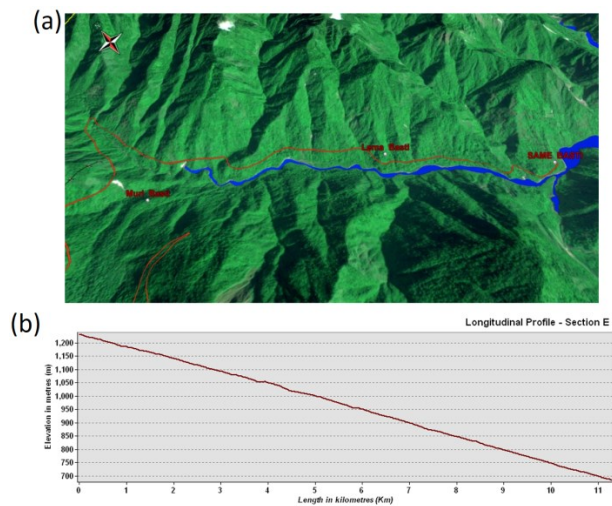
(a) 3D-view and (b) longitudinal profile of E section
